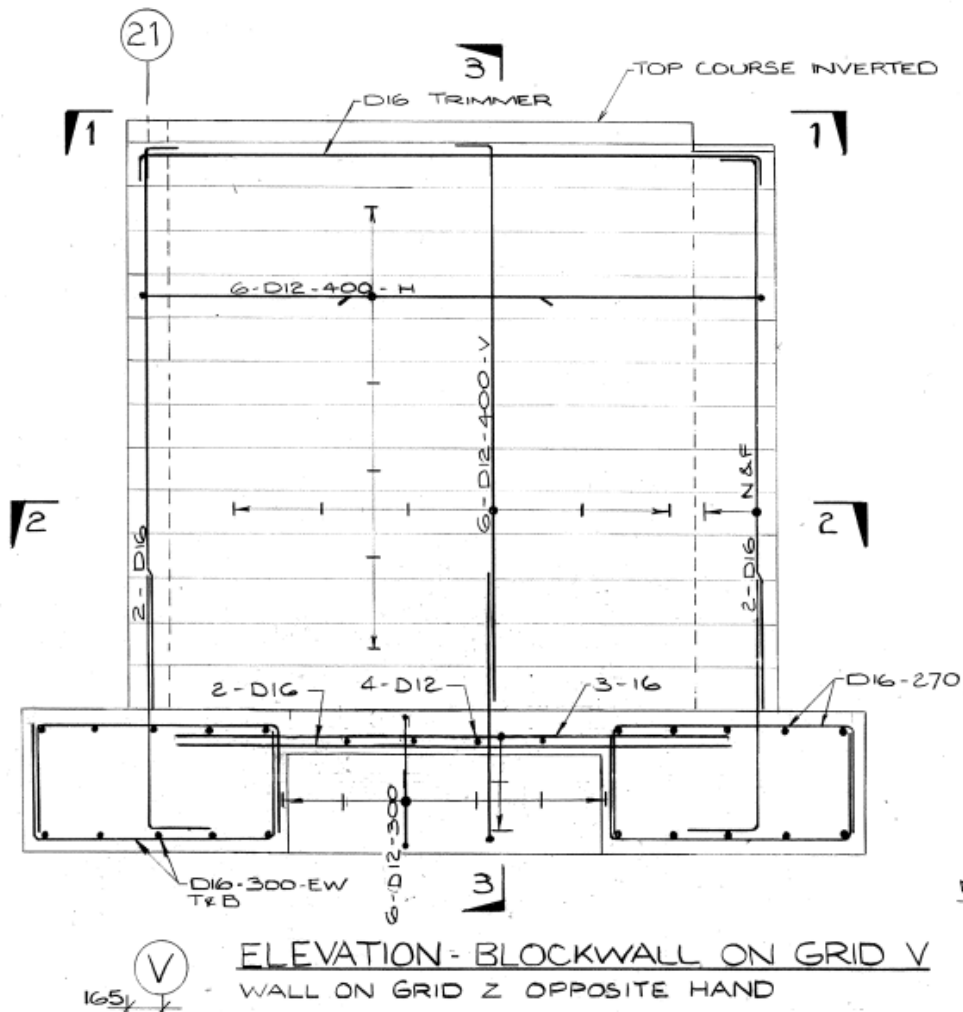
Typical Concrete Block Wall Elevation on Extension Central Wing (Grid Line 21, Z and V)
